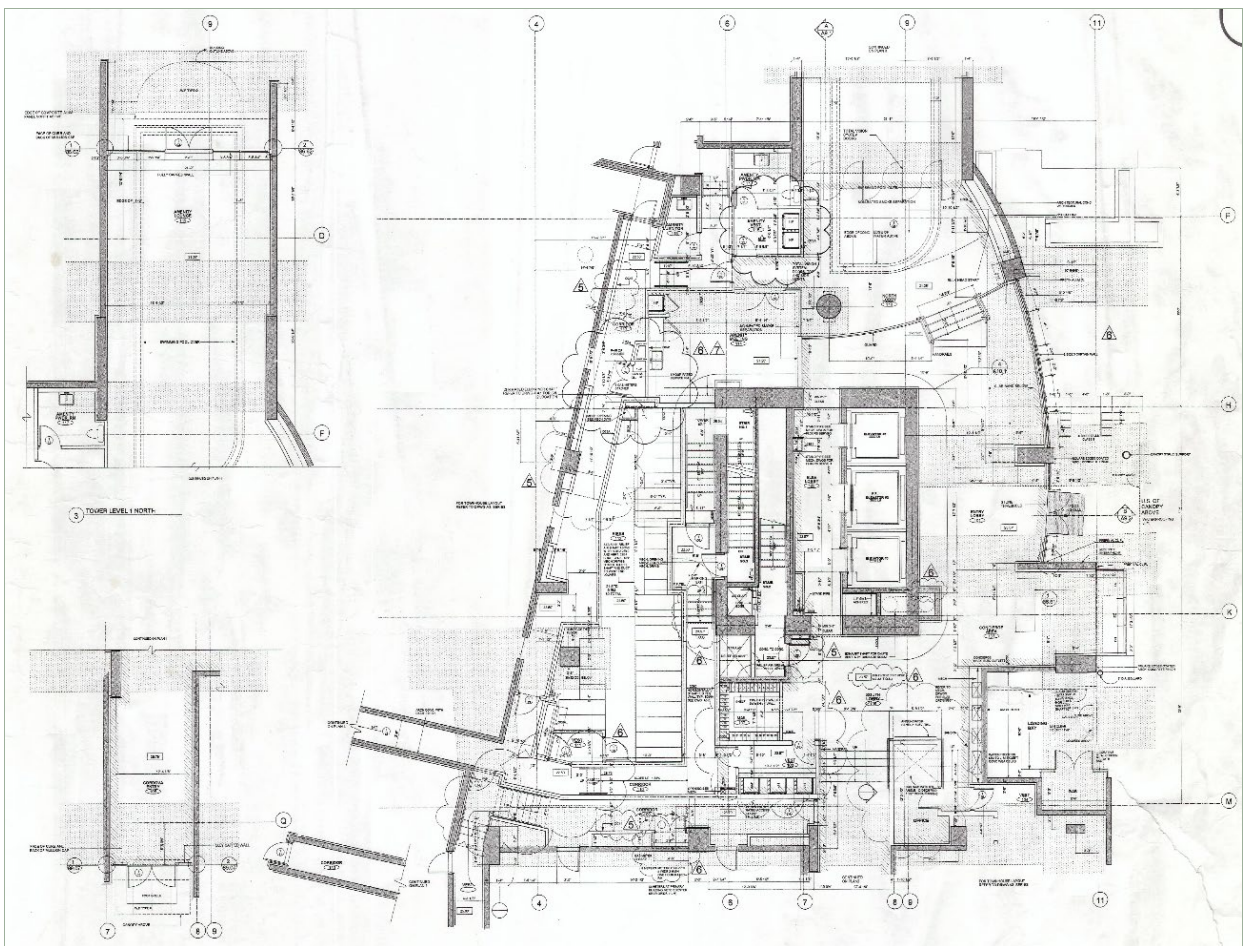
Site Plan of Callisto taken from Hancock, Brückner, Eng + Wright, Architectural Drawings, April 2002
